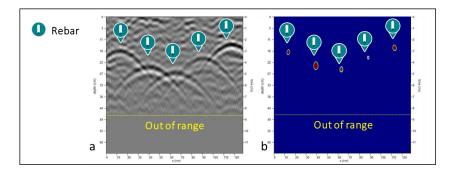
GSSI StructureScan Mini XT detects all rebars, but not the back wall
